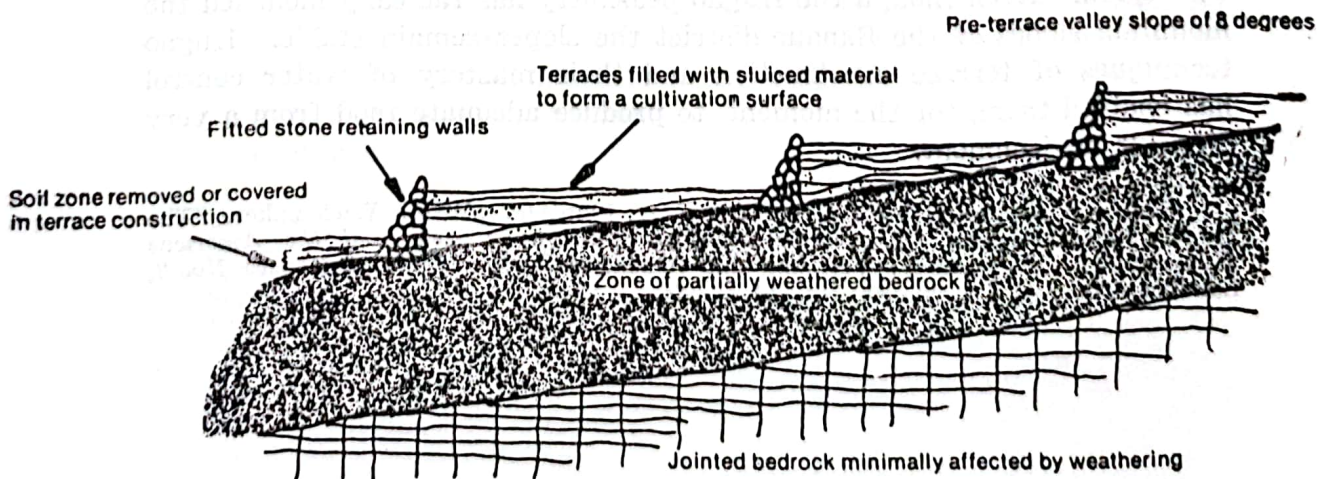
Cross-section of a rice terrace built with fitted stone retaining walls on a shallow valley slope.
